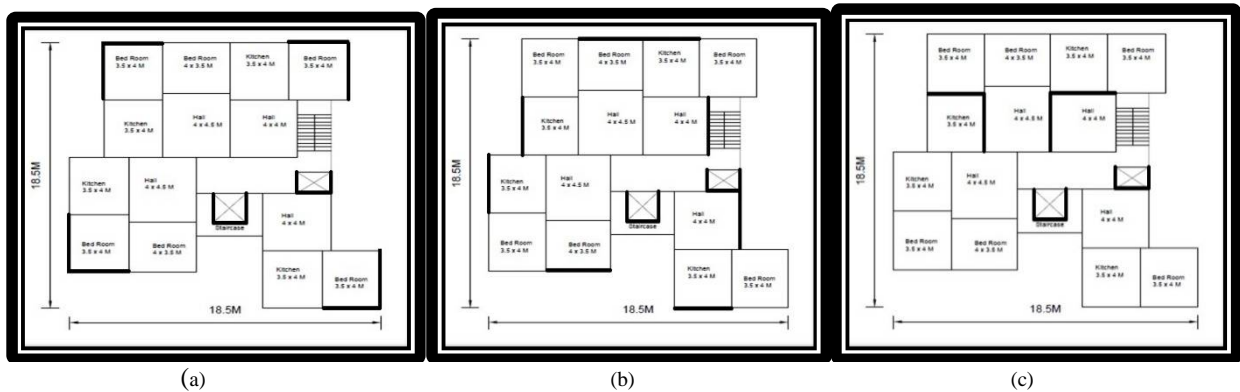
Plan of building (18.5m x 18.5m) of 17 storey.
